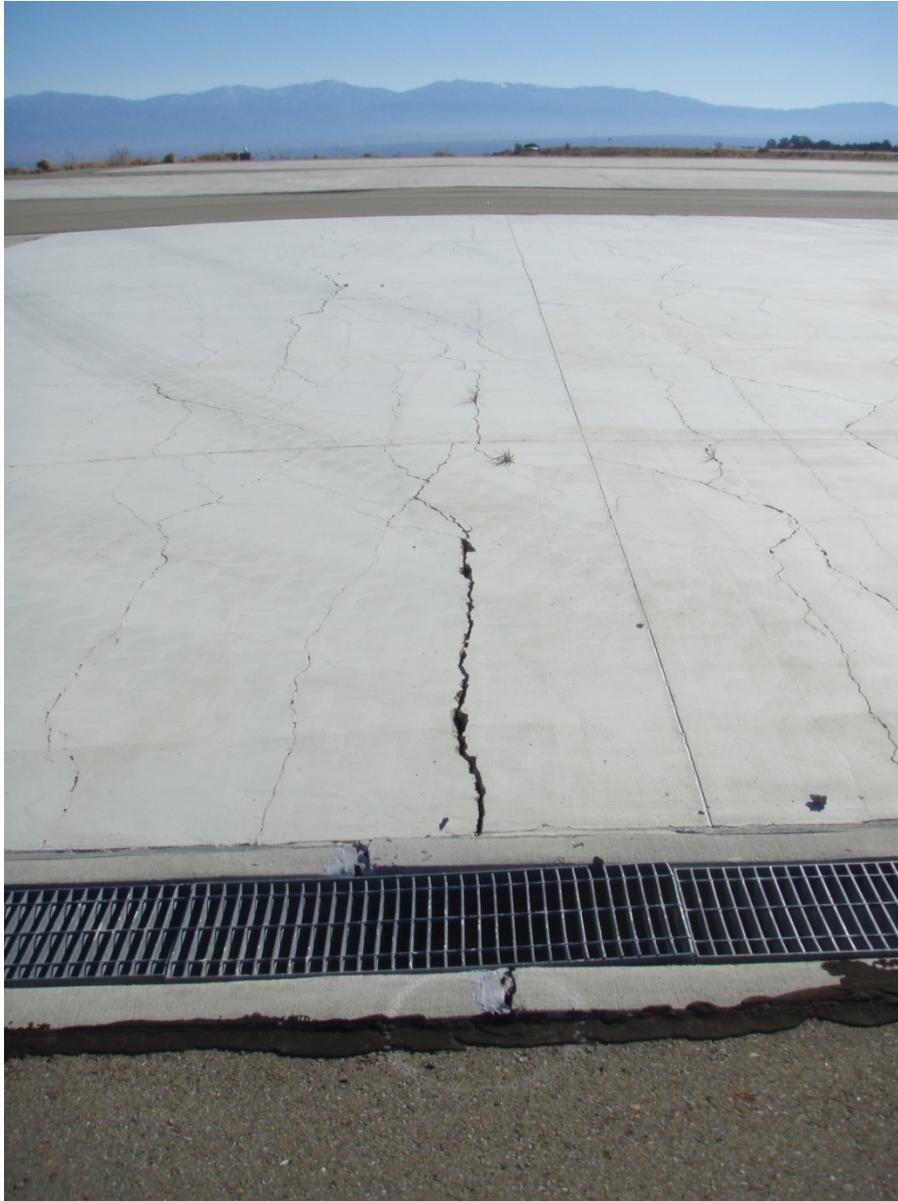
Cracks in concrete pad and trench drain at hangar pad 3
